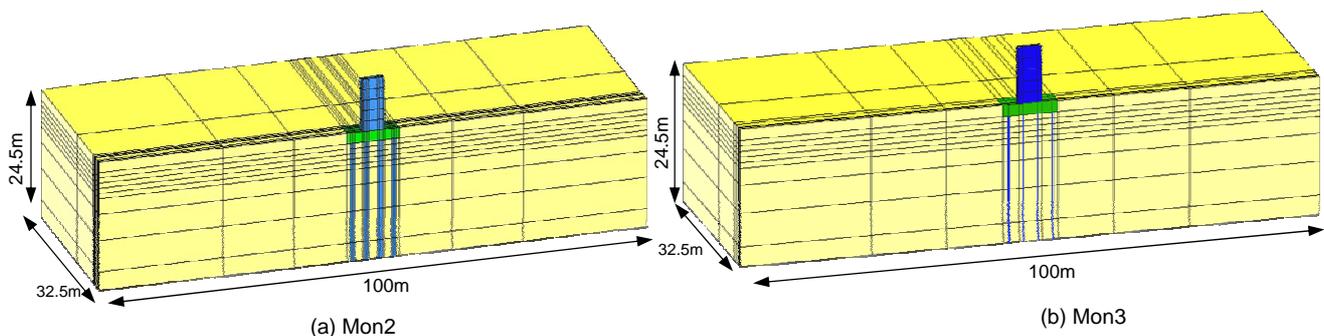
Analytical models (a) Pile modeled with solid element (b) Pile modeled with beam element
